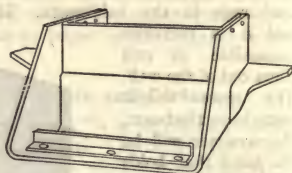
Duplex Extra-heavy Wall-hanger for Large Wooden Girder
